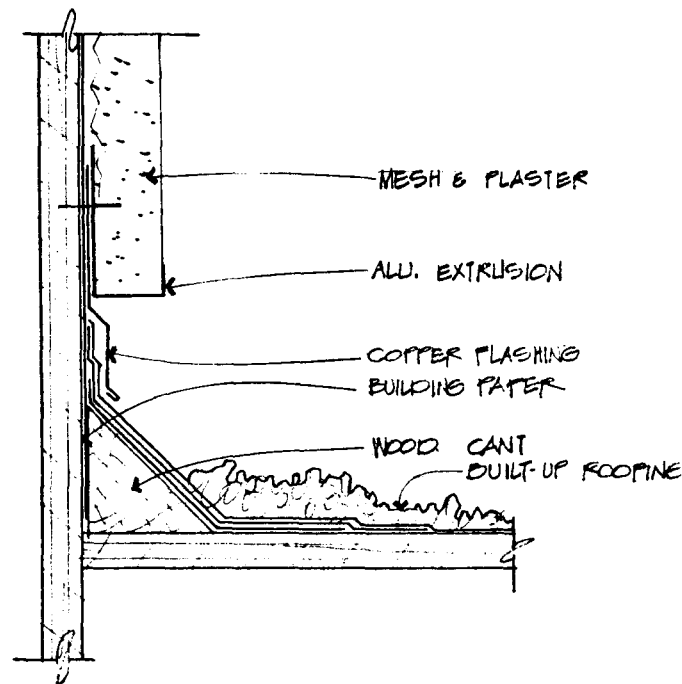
Detail of vertical/horizontal intersection as built showing reverse shingling of building paper and flashing.
